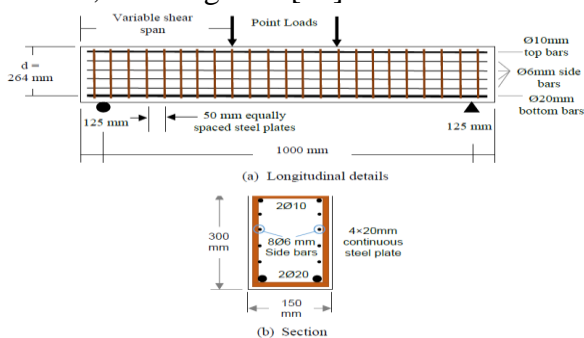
Details of beam dimensions and reinforcement of the deep beams[48].
